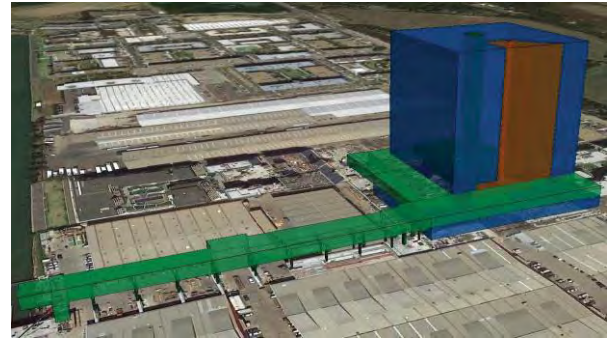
Stratum subdivision including bridge and Block B development at Wentworth Point
